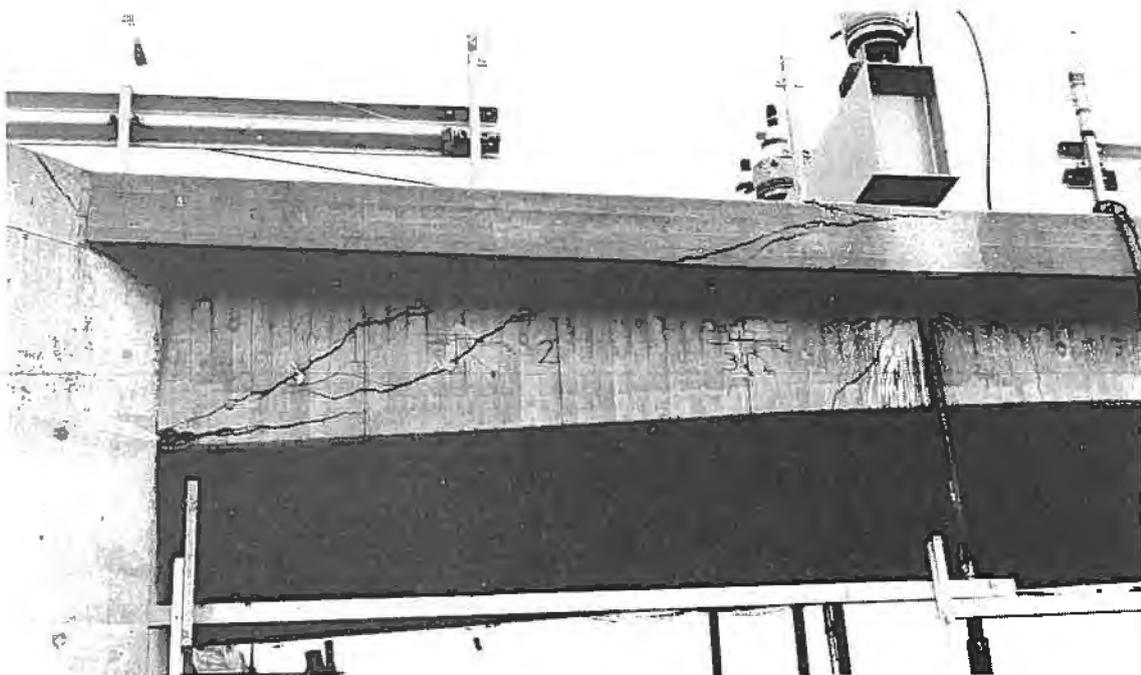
Shear failure in the non-prestressed bridge
